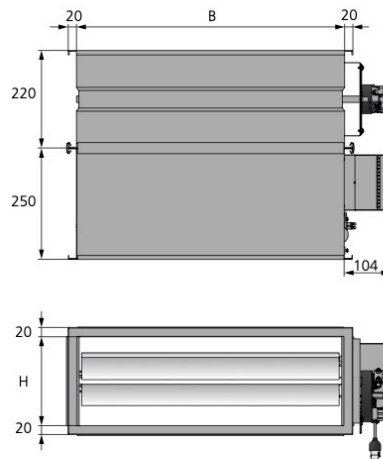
Dimensions, WISE Damper rectangular and WISE Damper rectangular with spring return.
